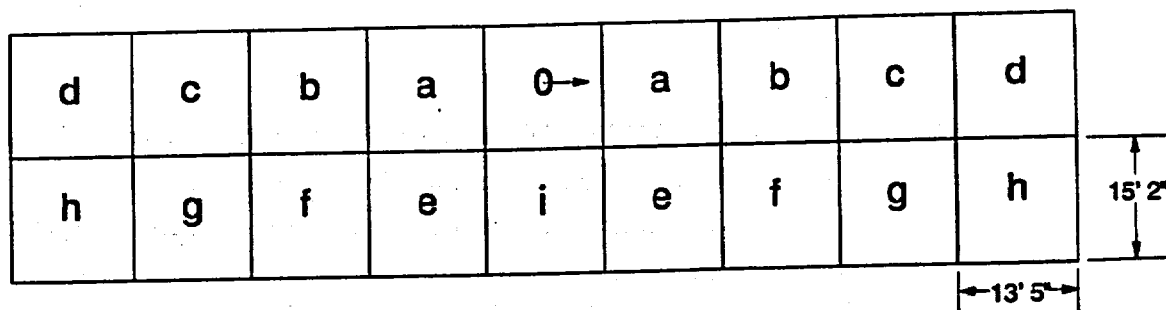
Plan Drawing of Baghouse — Dimensions Are Typical of All Modules
